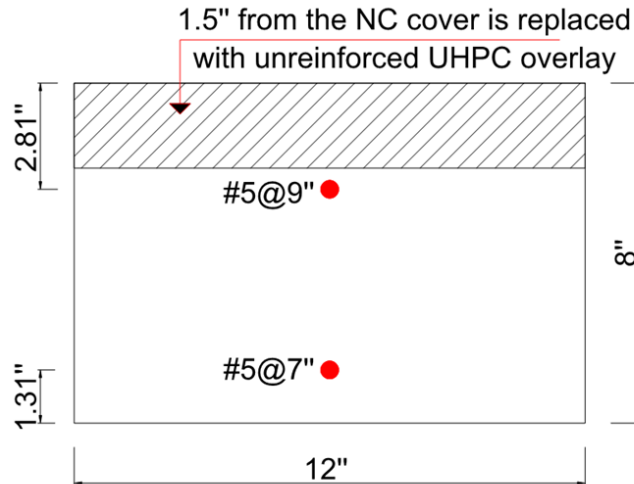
The design of NC bridge deck section (FHWA, 2024).
